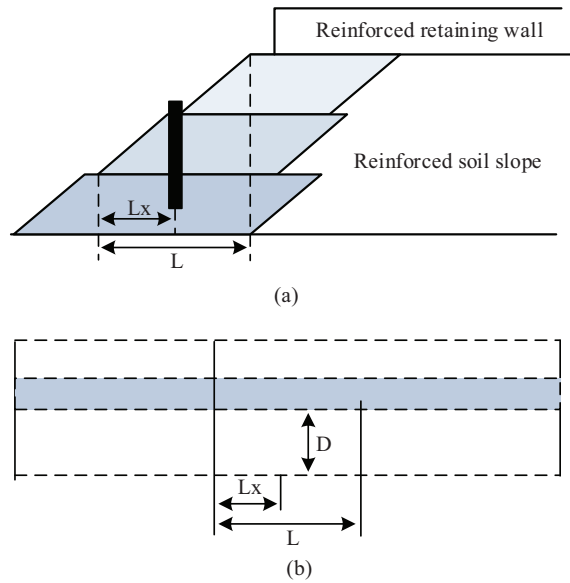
Geometric schematic diagram of slope reinforcement with anti slip piles: a) Cross section of anti slip pile reinforcement slope, b) Layout plan of anti slip pile reinforcement slope
